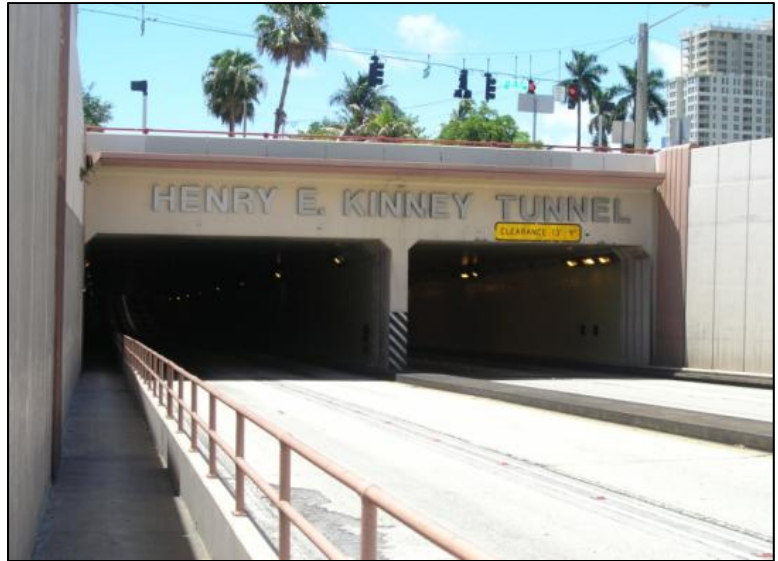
Henry Kinney Tunnel, Broward County (No. 764039)
